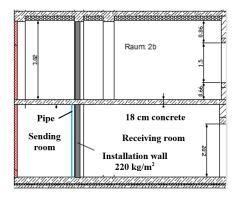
Test set-up from Figure 1 installed in a building-like test stand with a 11,5 cm thick plastered installation wall made of CaSi bricks and a surface mass of 220 kg/m².
